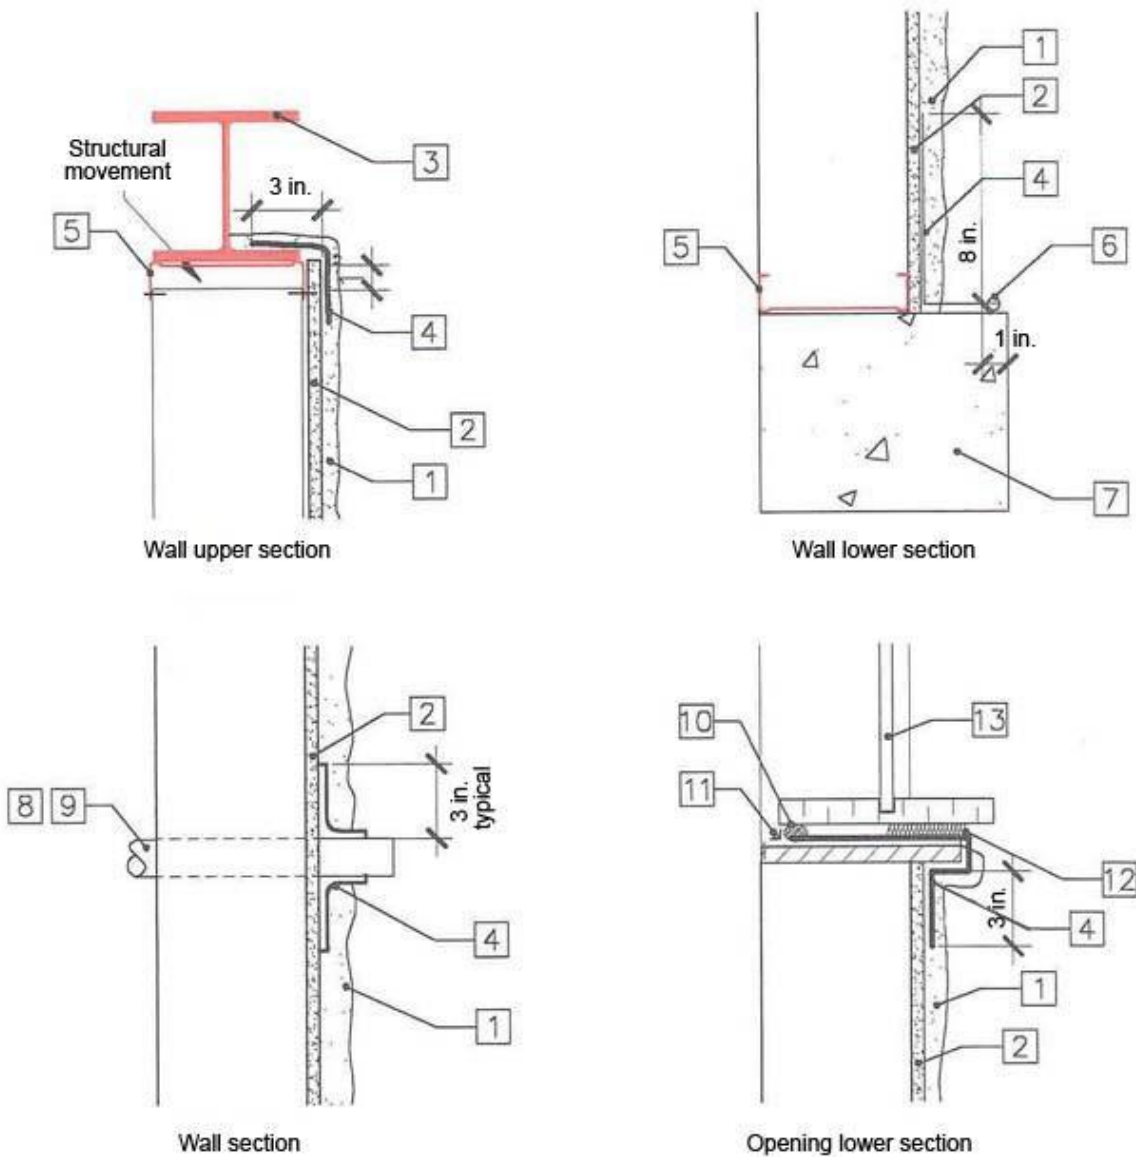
Details of transition membrane at joints between exterior sheathing wall and penetrations
